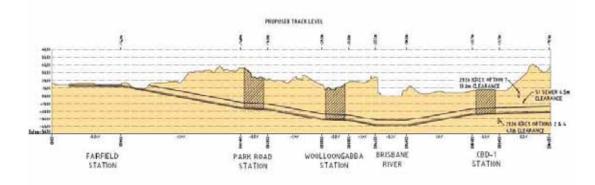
All options (2016) Tunnelling long section - Fairfield to CBD1
